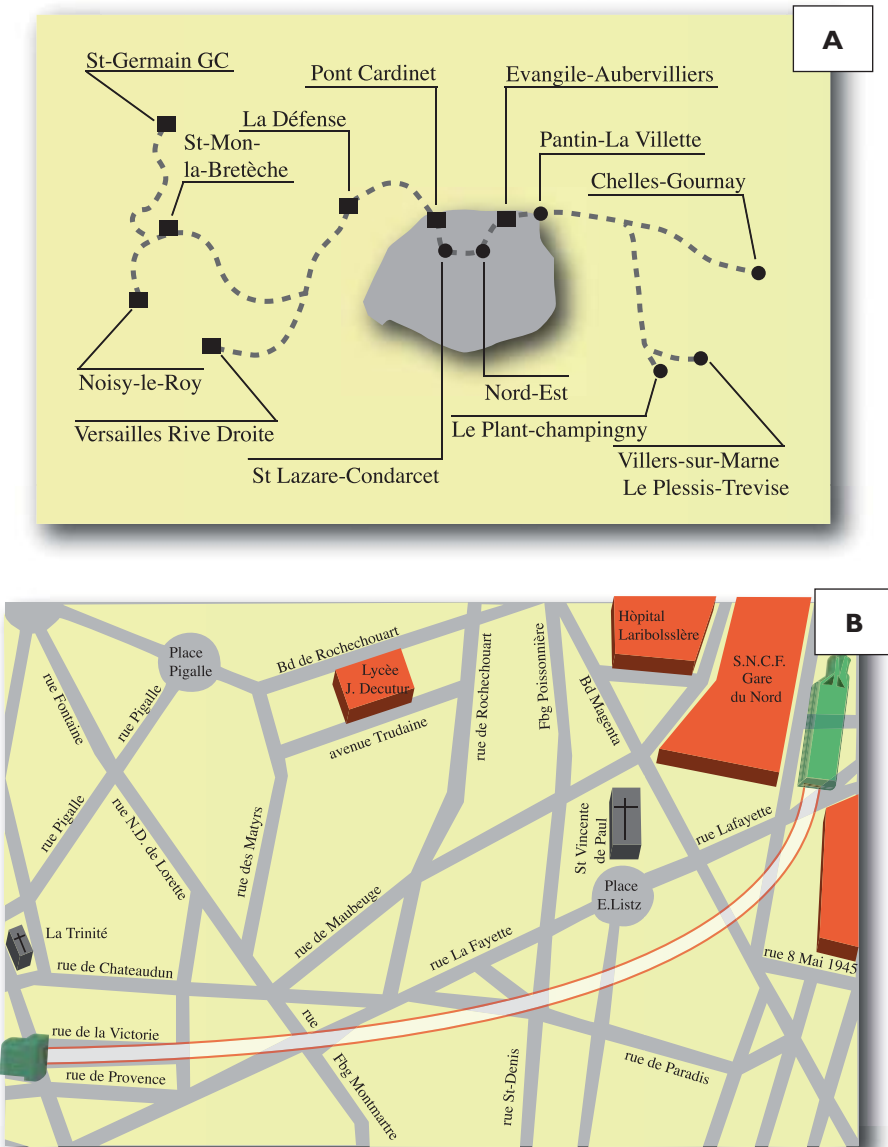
Plan view of the St. Lazare and Nord Est stations and the connected tunnel (A: general layout, B: detailed plan view).
